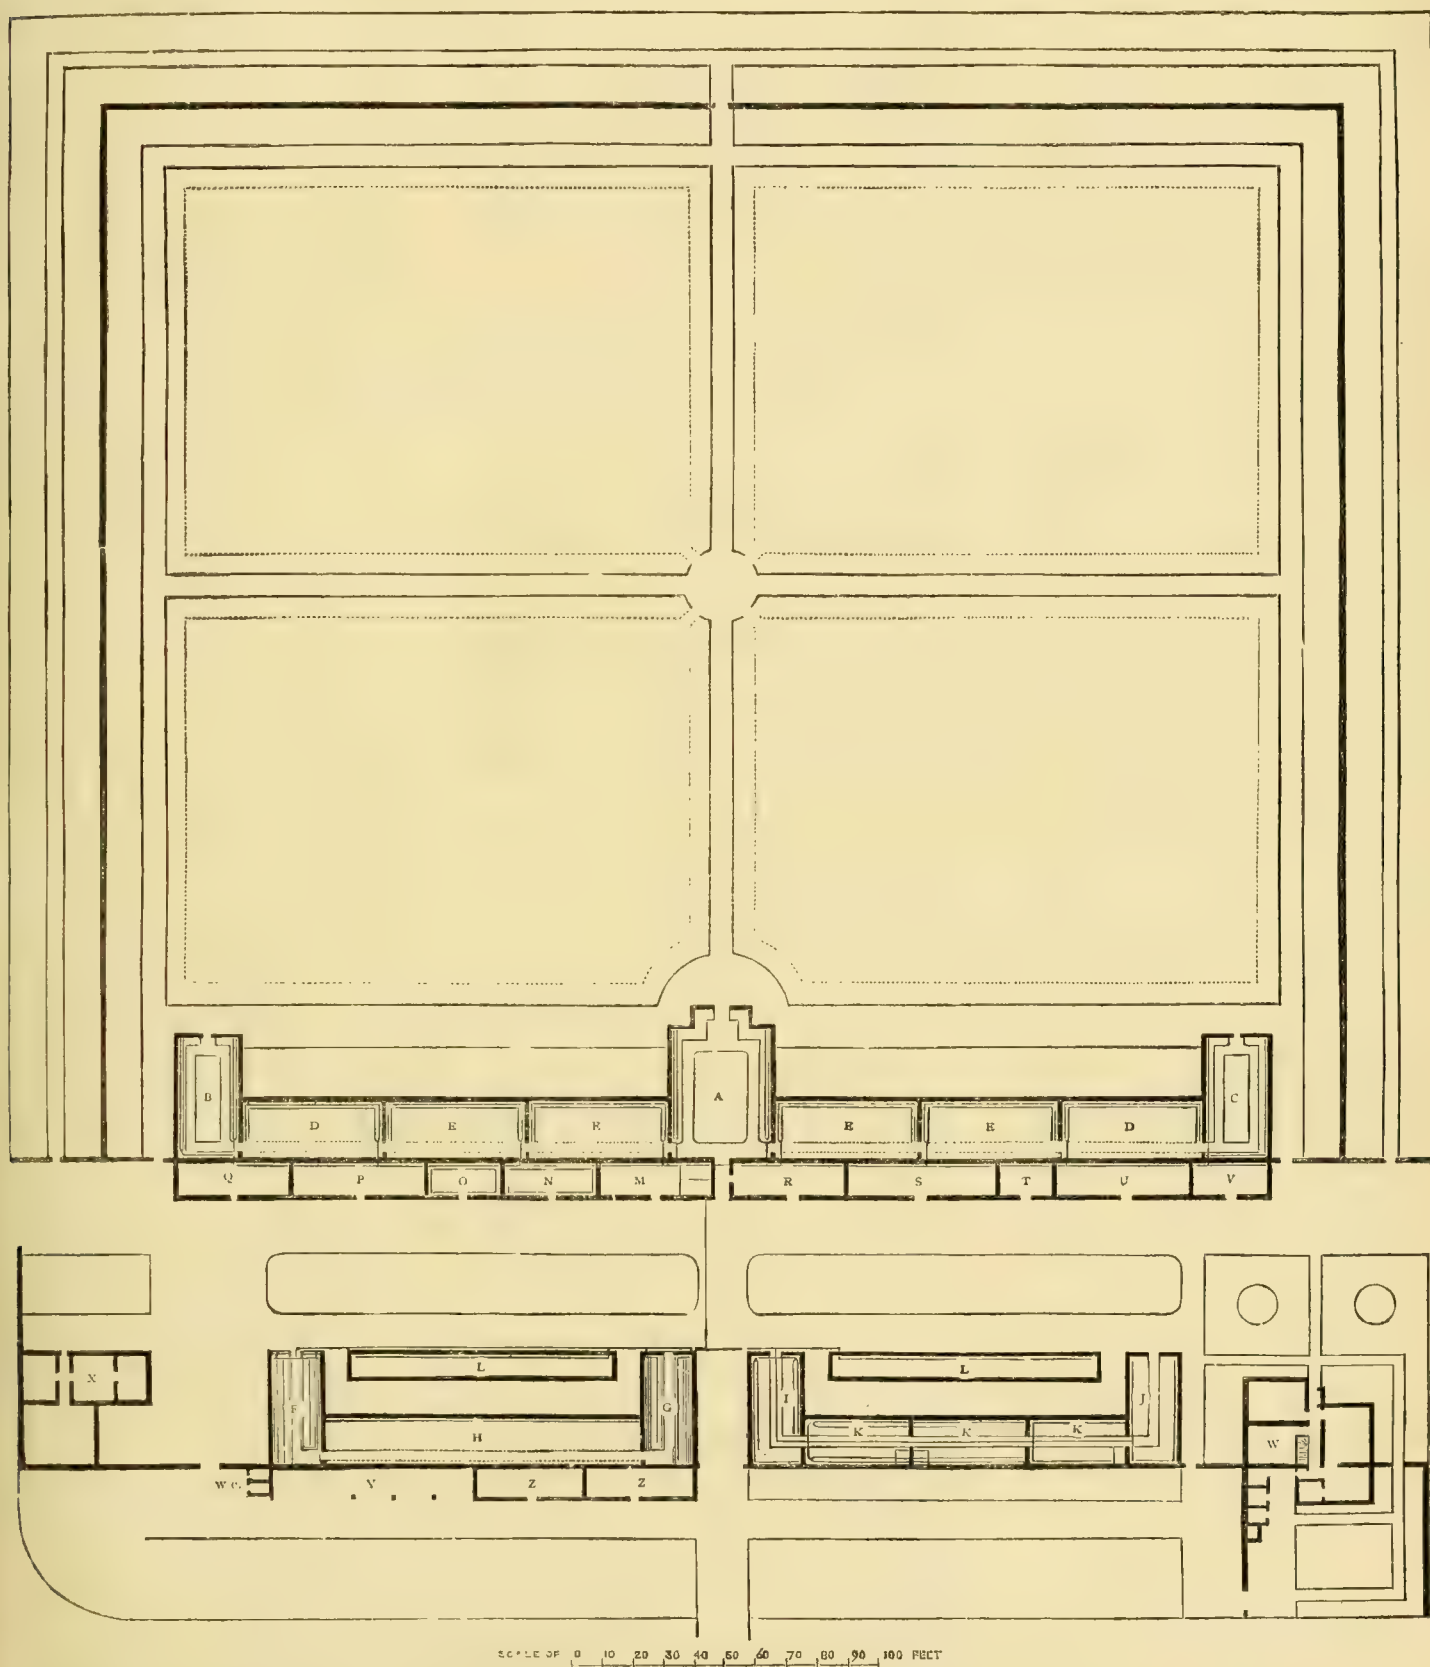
MR. CHARLES WEBSTER'S (2D PRIZE) PLAN OF A KITCHEN GARDEN.
